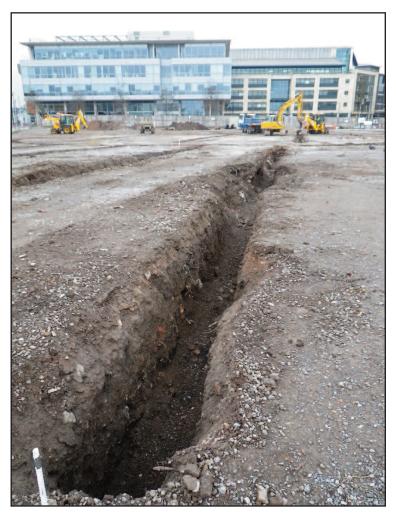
Foundation and drainage trenches for the new temporary events space, viewed from the east
